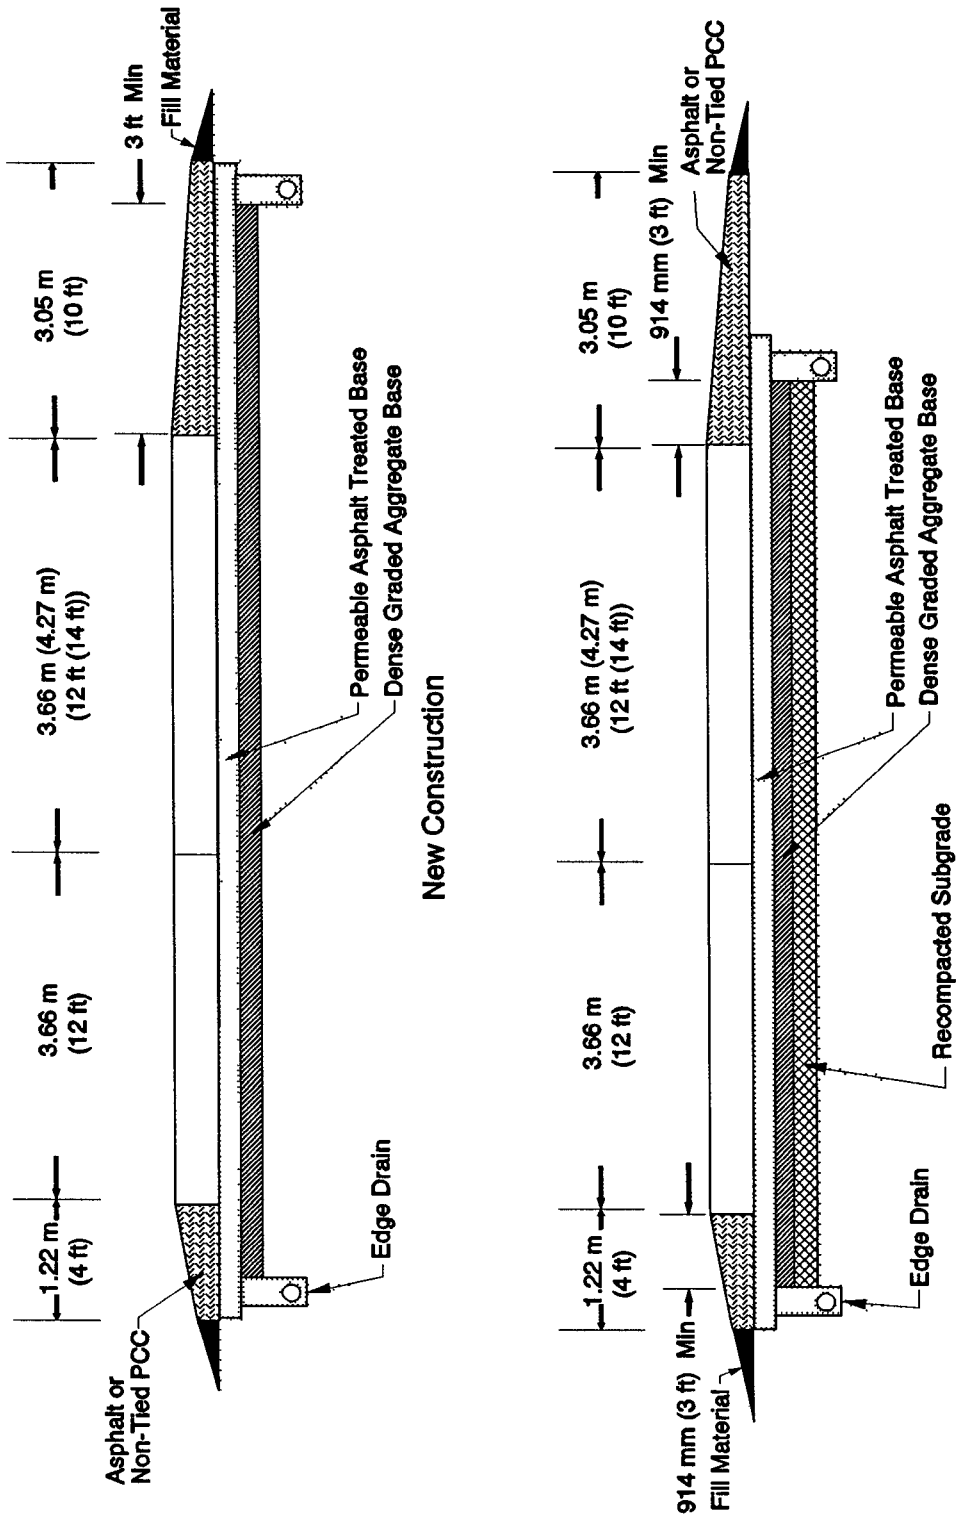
Typical Section for Test Sections with Drainable Base Layer
